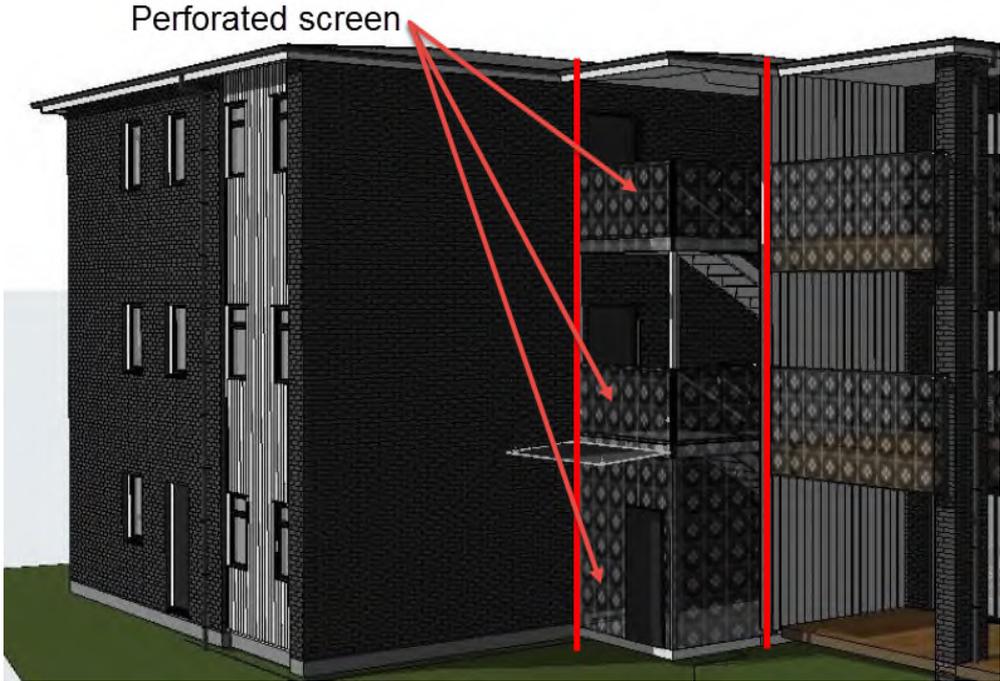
Perspective view showing the common stairwell (between the red lines) facing North West (not to scale).
